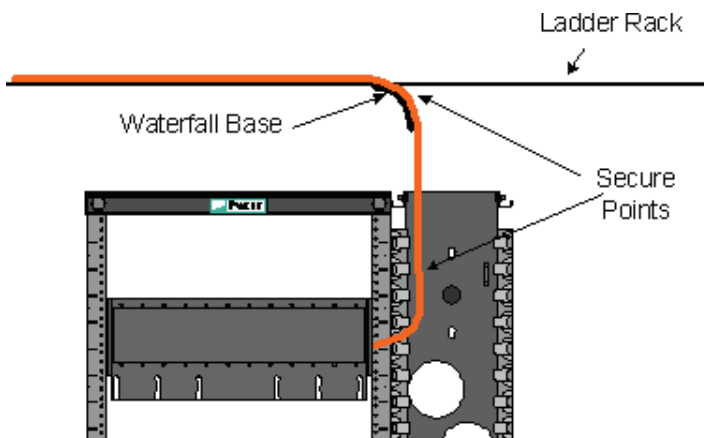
Schematic of overhead ladder rack to rack/cabinet transition.
